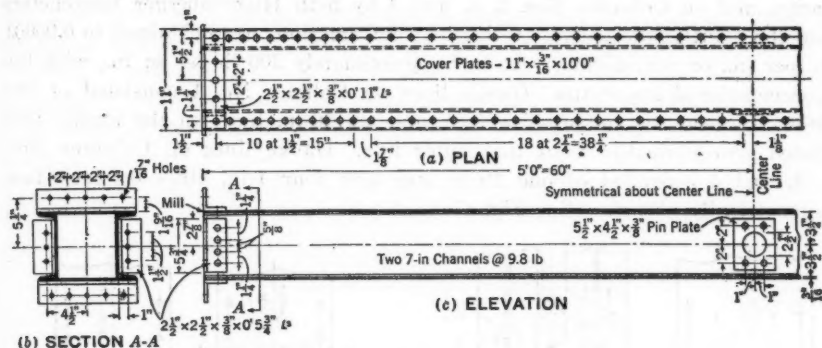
DETAILS AND DIMENSIONS, COLUMN NO. 3.
